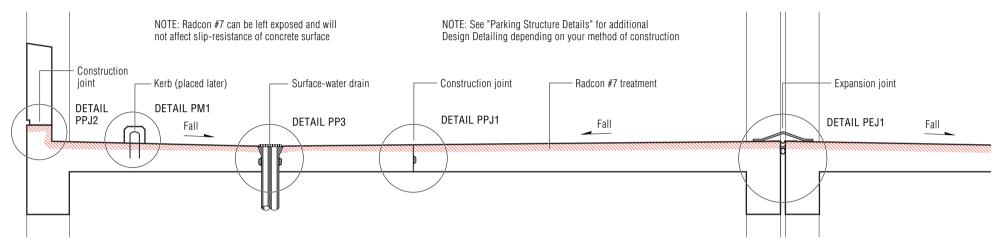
ADDITIONS TO STRUCTURAL SLABS
